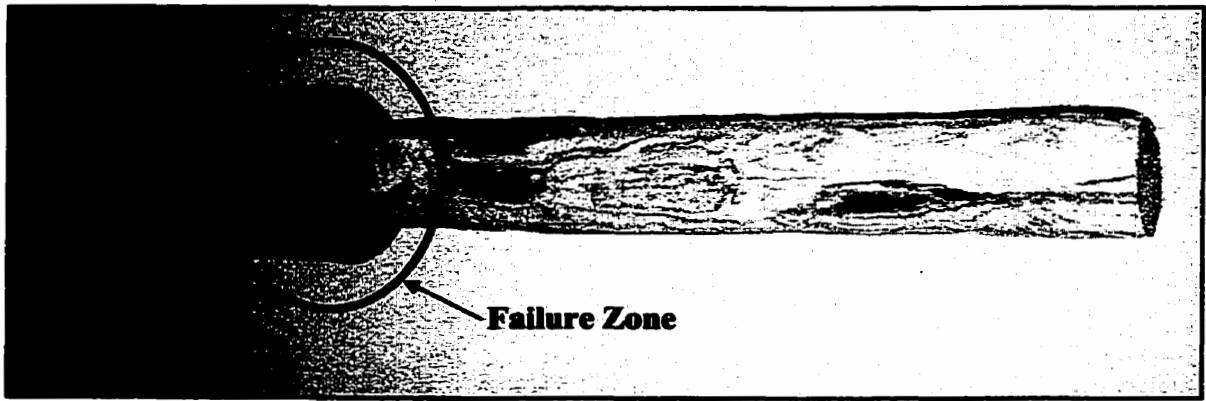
(a): Photo of Trimmed Timber Pile Before Grout Injection
